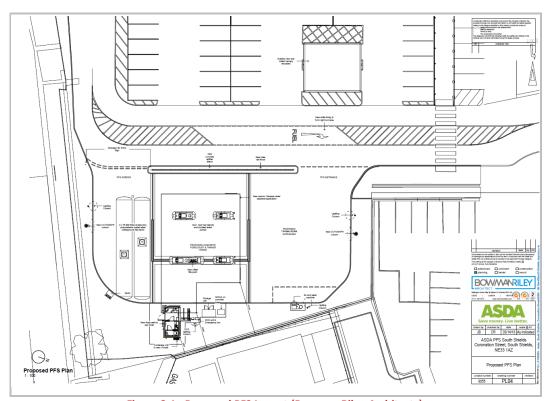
Proposed PFS Layout (Bowman Riley Architects)
